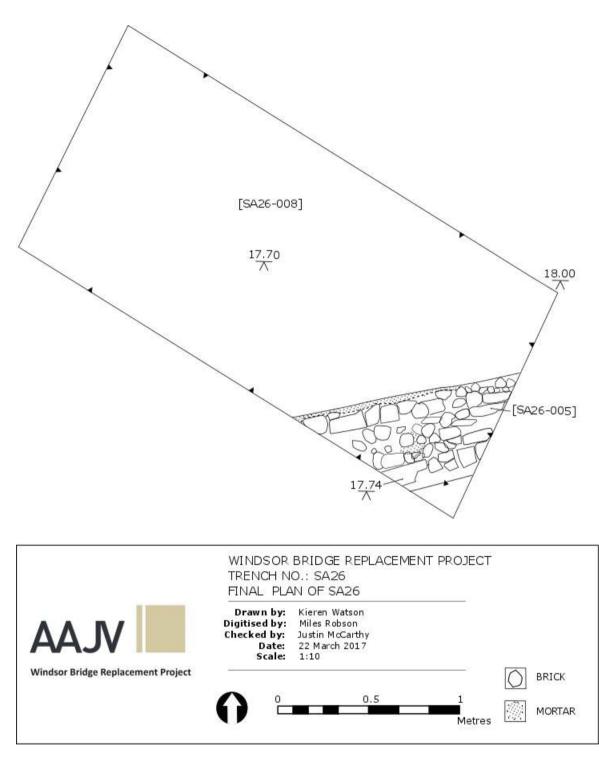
Post-excavation plan of SA 26 showing brick drain [SA26-005].
